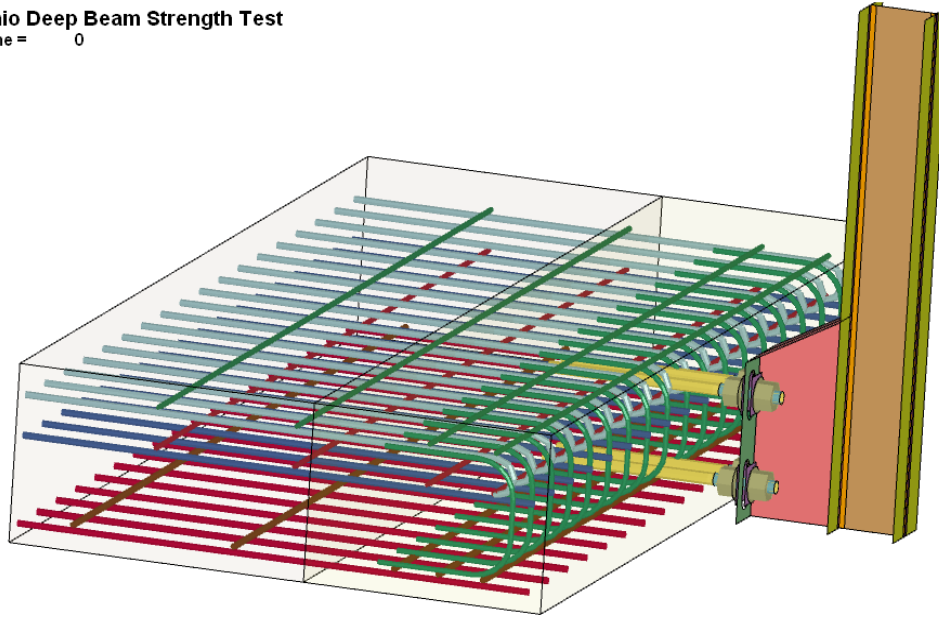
Model view showing the reinforcement and anchor details of the deck
